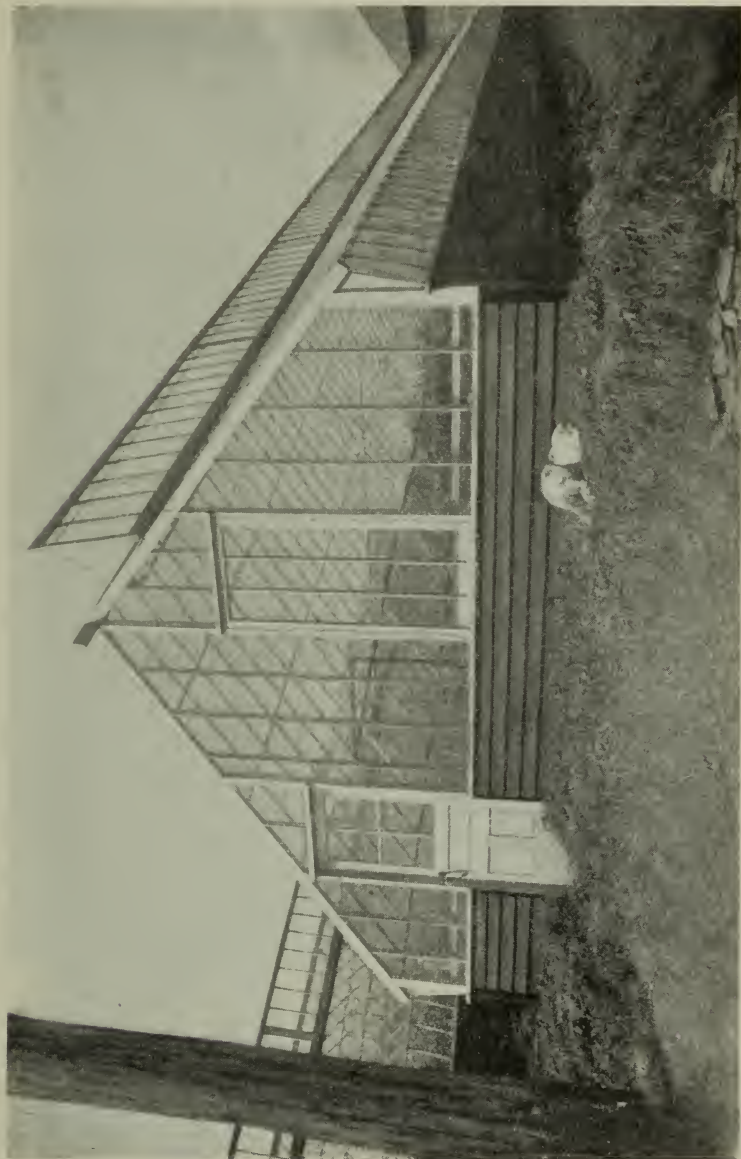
END VIEW OF MODIFIED 3-SPAN HOUSE WITH LONG SPAN TO THE SOUTH.
